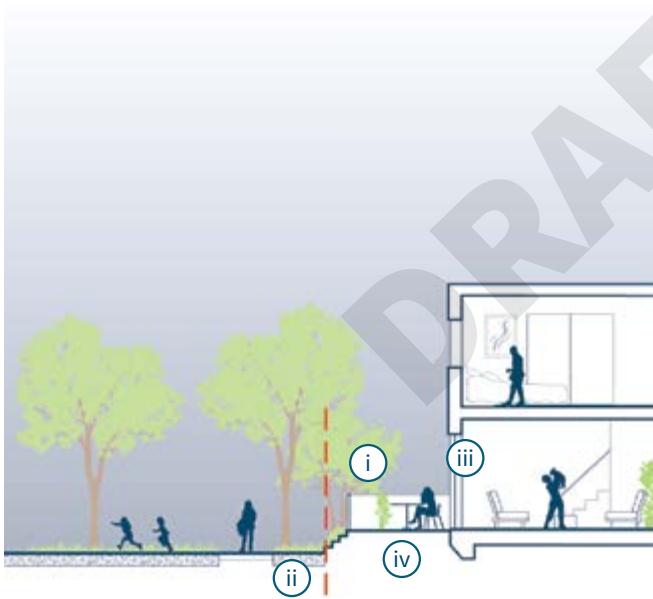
Raised front setback entry to public open space with planting in front of the fence minimises overlooking into private spaces.
